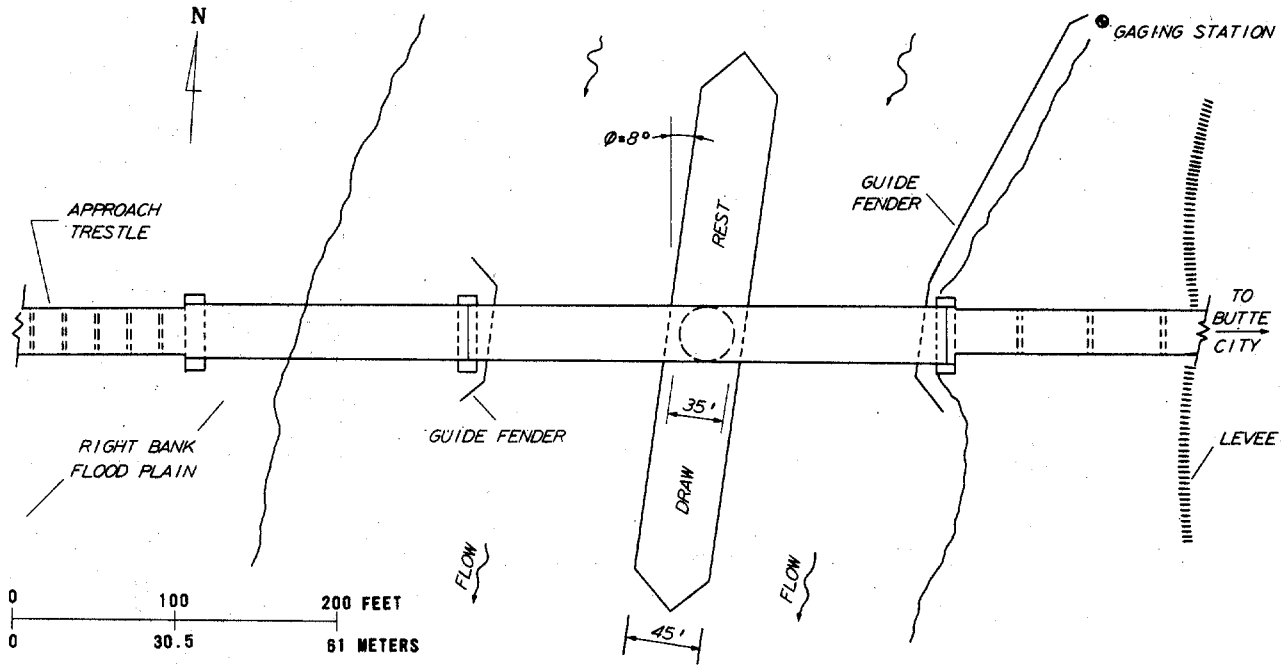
Plan of bridge across main channel of Sacramento River on SR-162 at Butte City.
